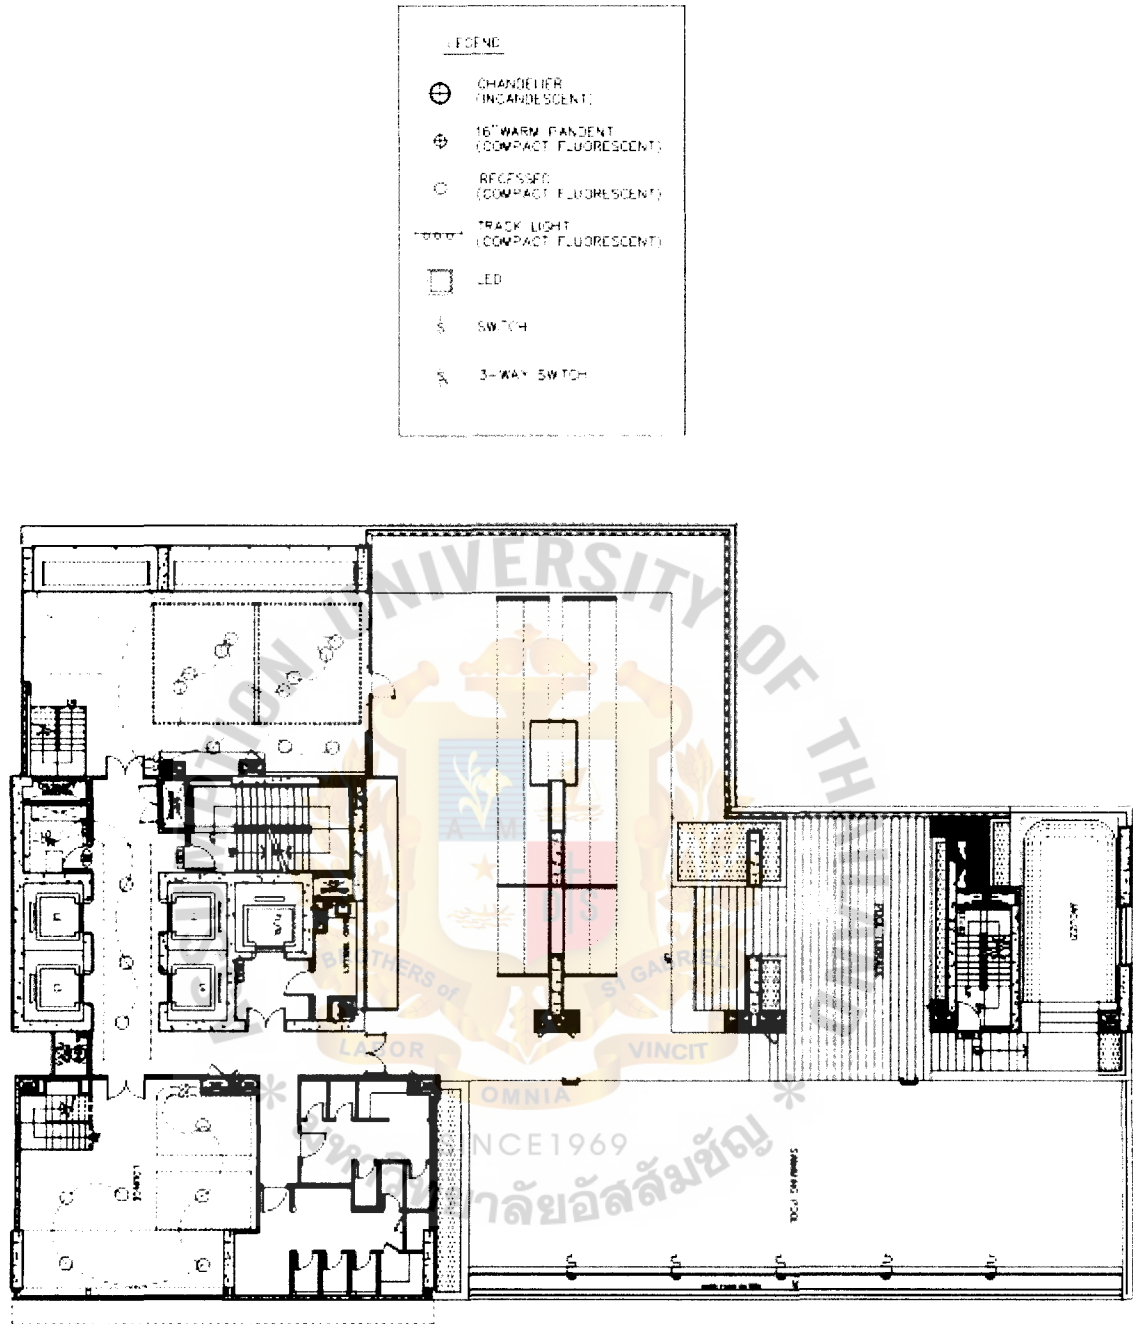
Reflected Ceiling and Lighting Plan of 27th floor plan
